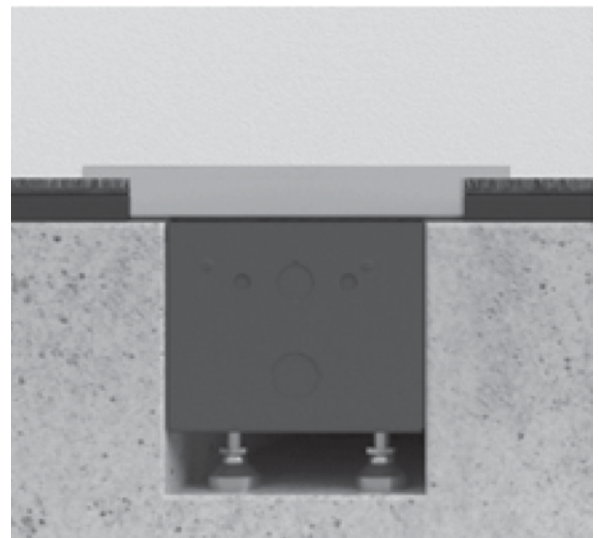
B: Surface Mount – Grille Flange Sits on Top of Floor
